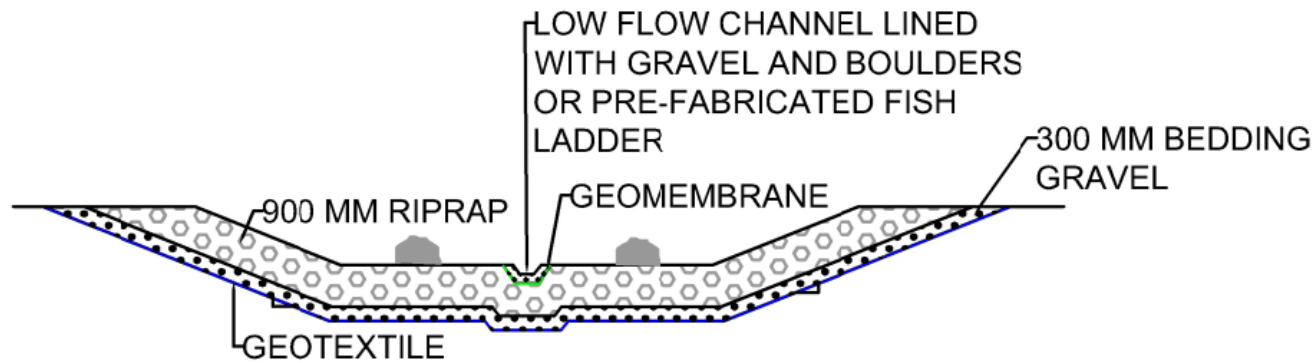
Design Type 3 - Cross Section of Rock Ramp
